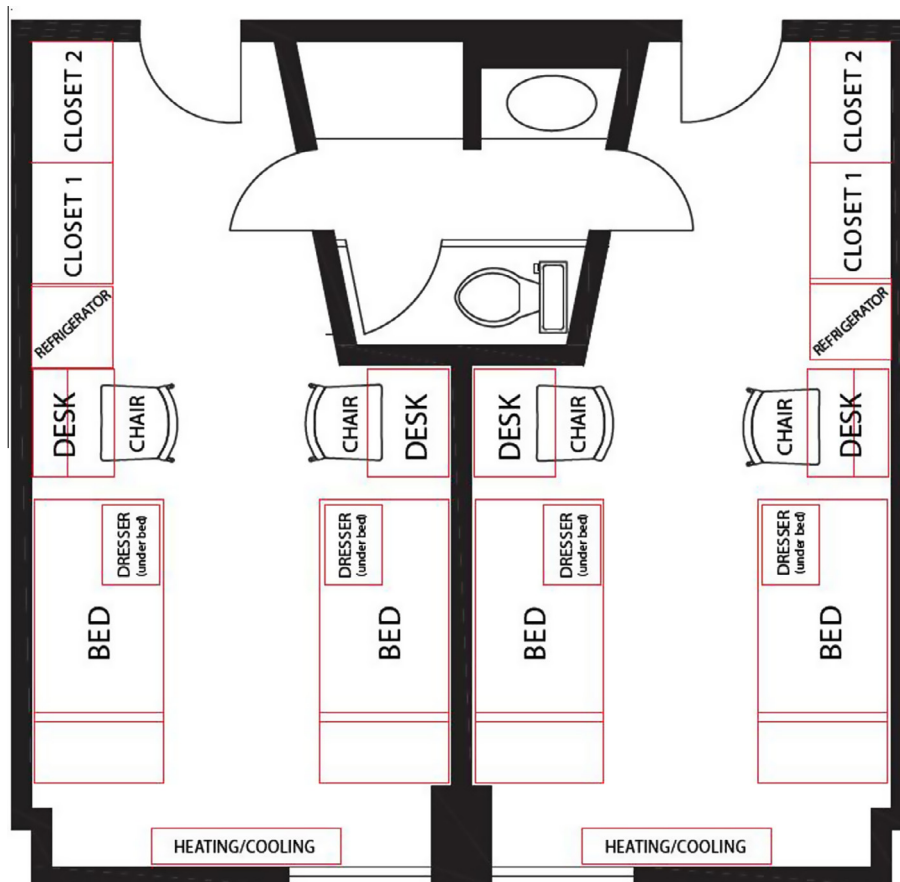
Coronado room floor plan (Source: Residence Life, The University of Arizona, (<http://www.life.arizona.edu/images/floorplans/coro-floorplan.PNG?sfrsn=2>).
